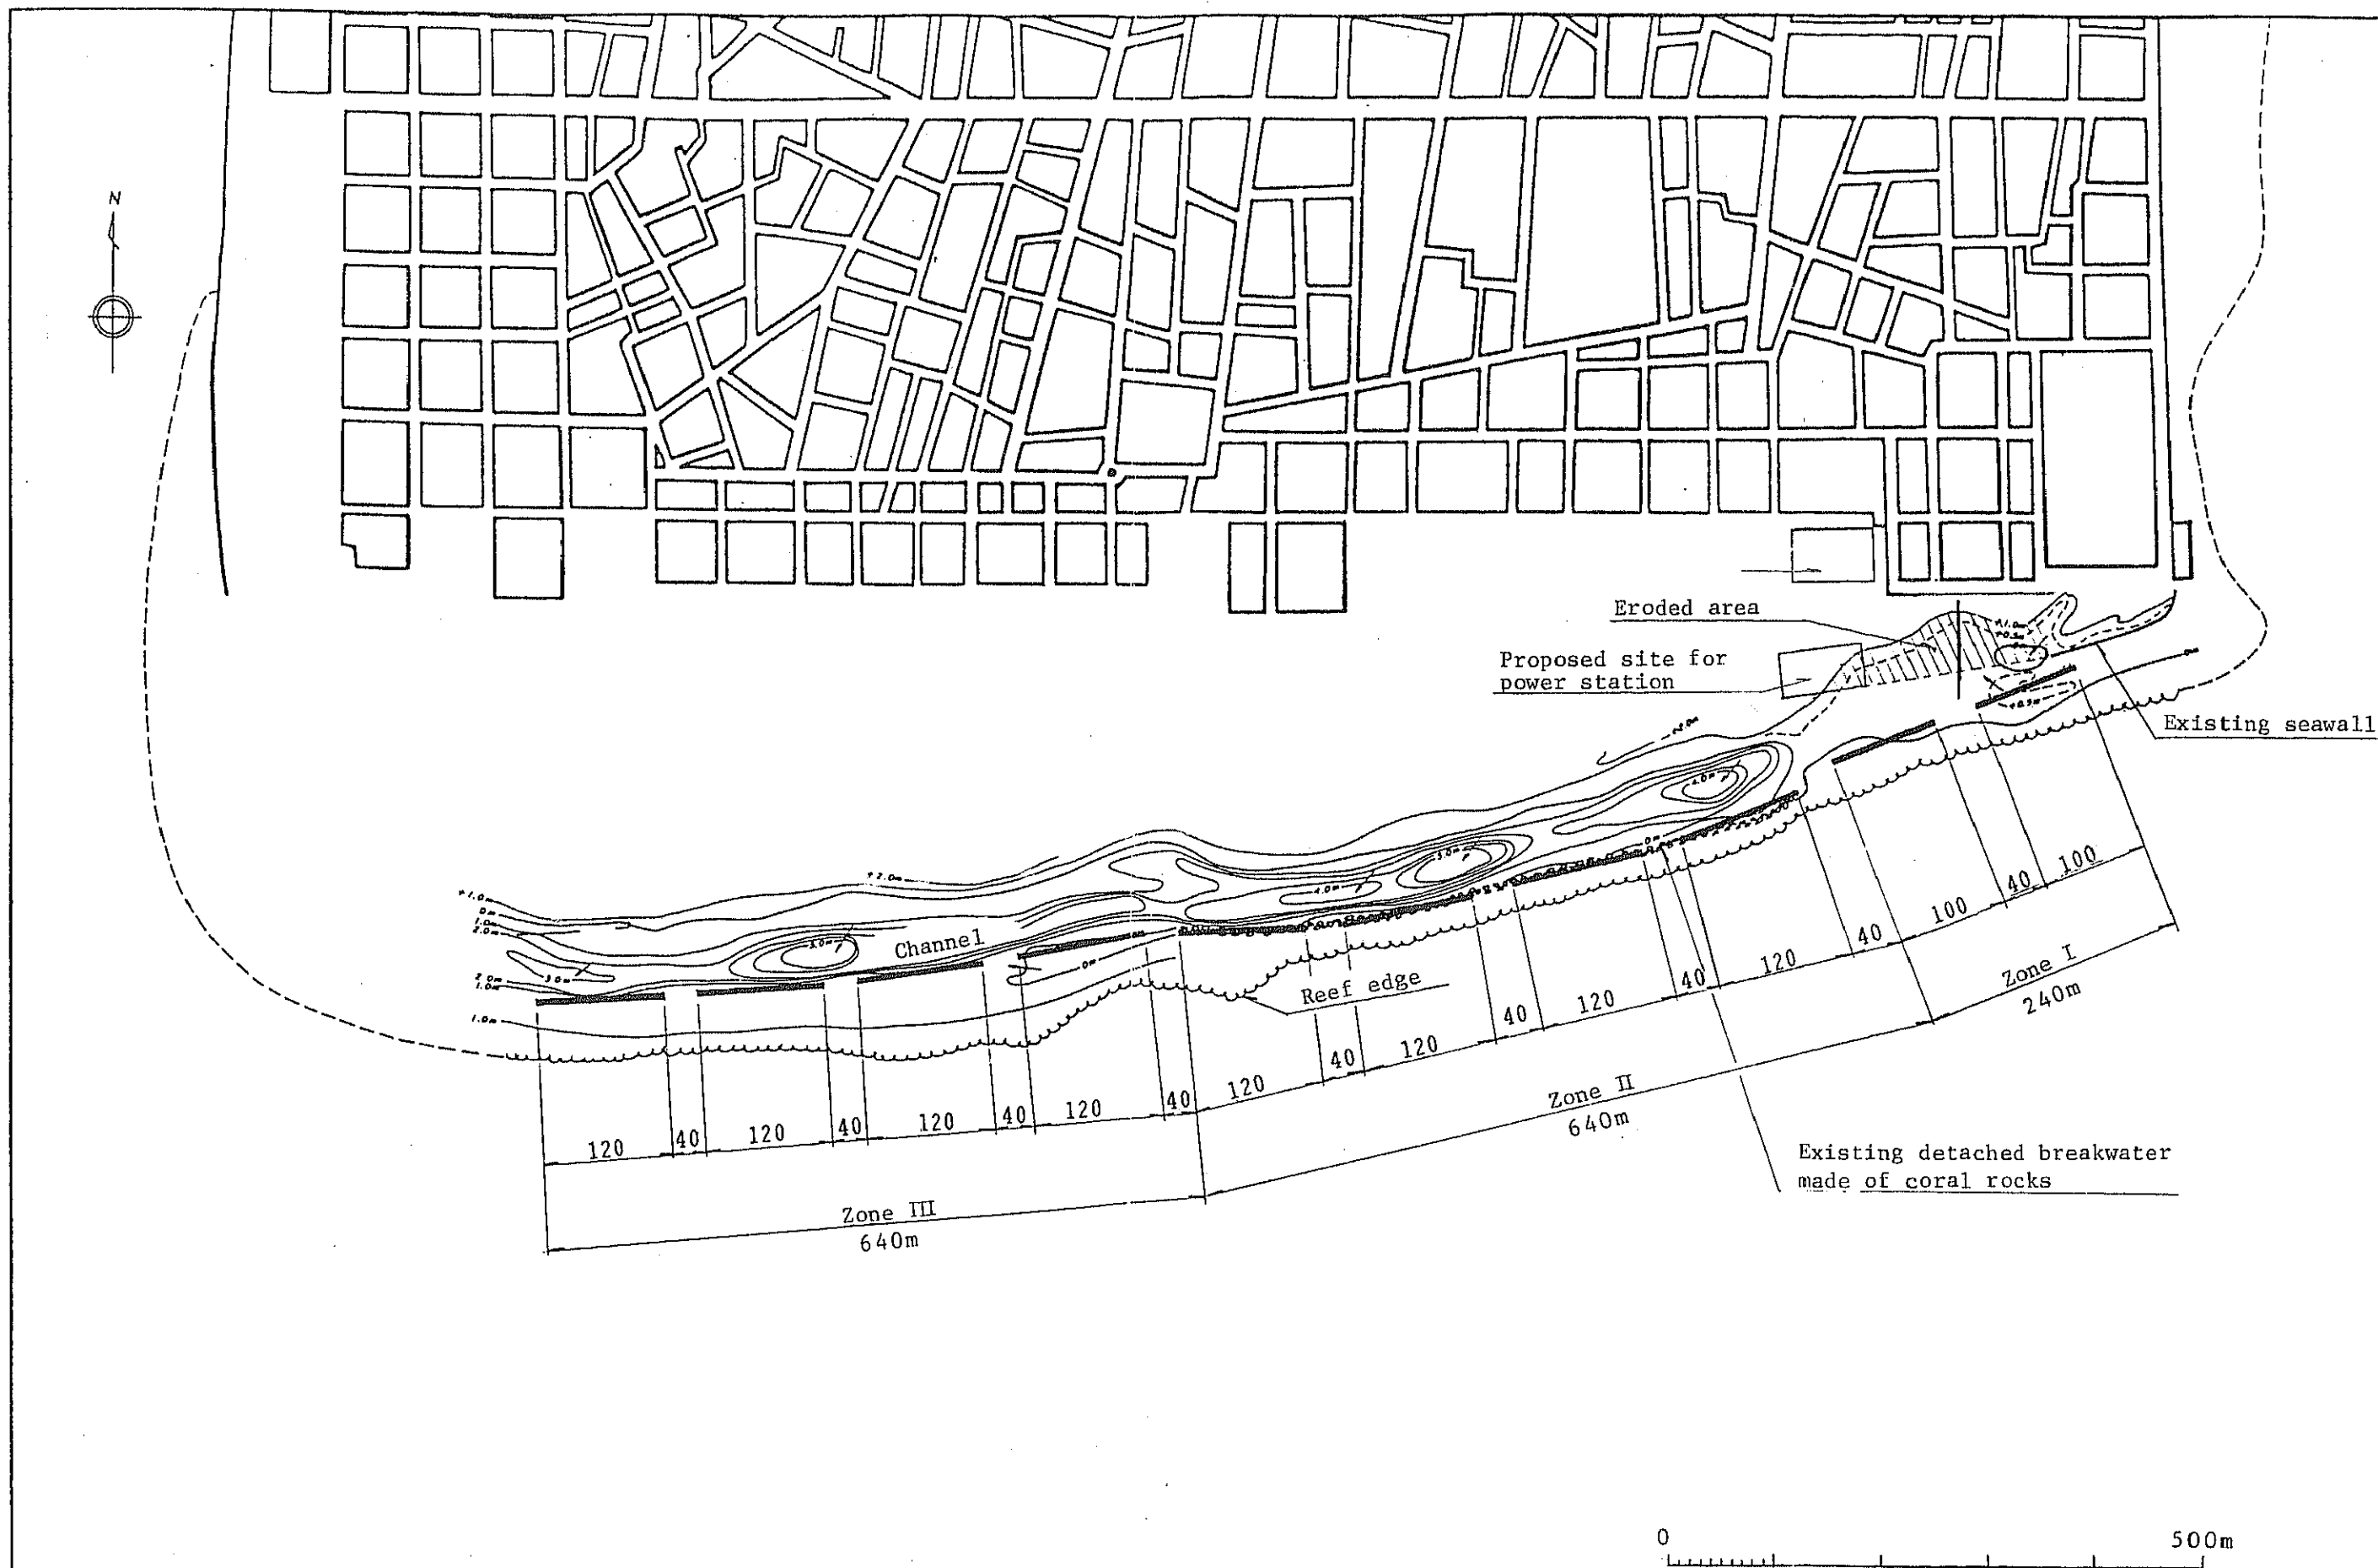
Detached breakwaters construction area and the arrangement plan.
